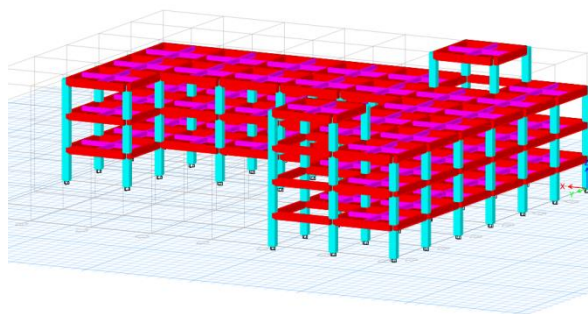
Asymmetric 15 Bedded Hospital Building 3D Frame
